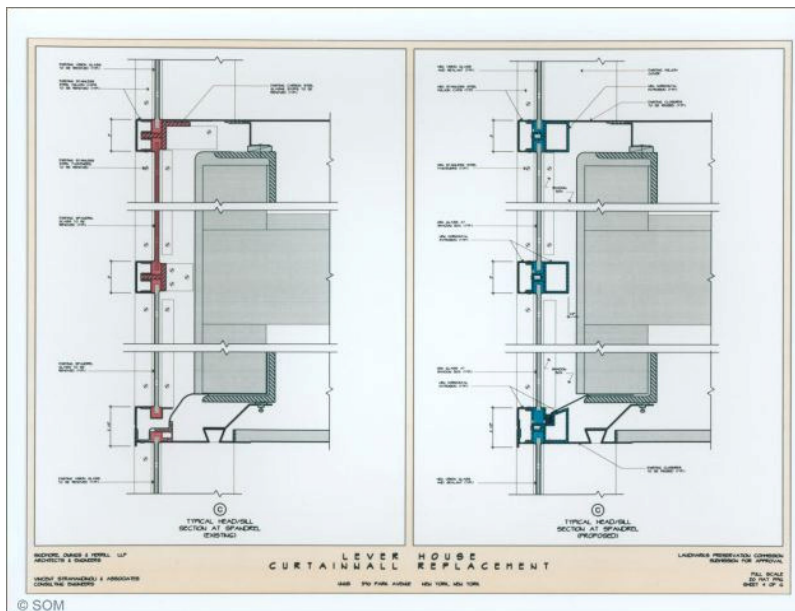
The Lever House was re-skinned with new materials but has retained the original appearance. The above drawing shows the original detail (left) and new detail (right). The glass is green-tinted and single-paned, as in the original, but now it is heat-strengthened instead of annealed. While parts of the underlying curtain-wall structure of carbon steel have been kept, a new aluminum receiver system was added.
